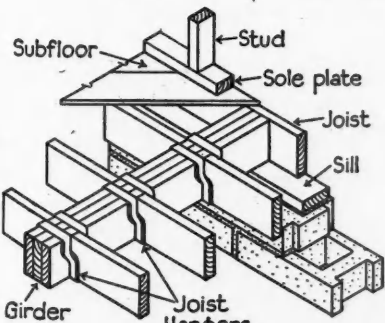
FRAMING JOIST LEVEL WITH TOP OF GIRDER
